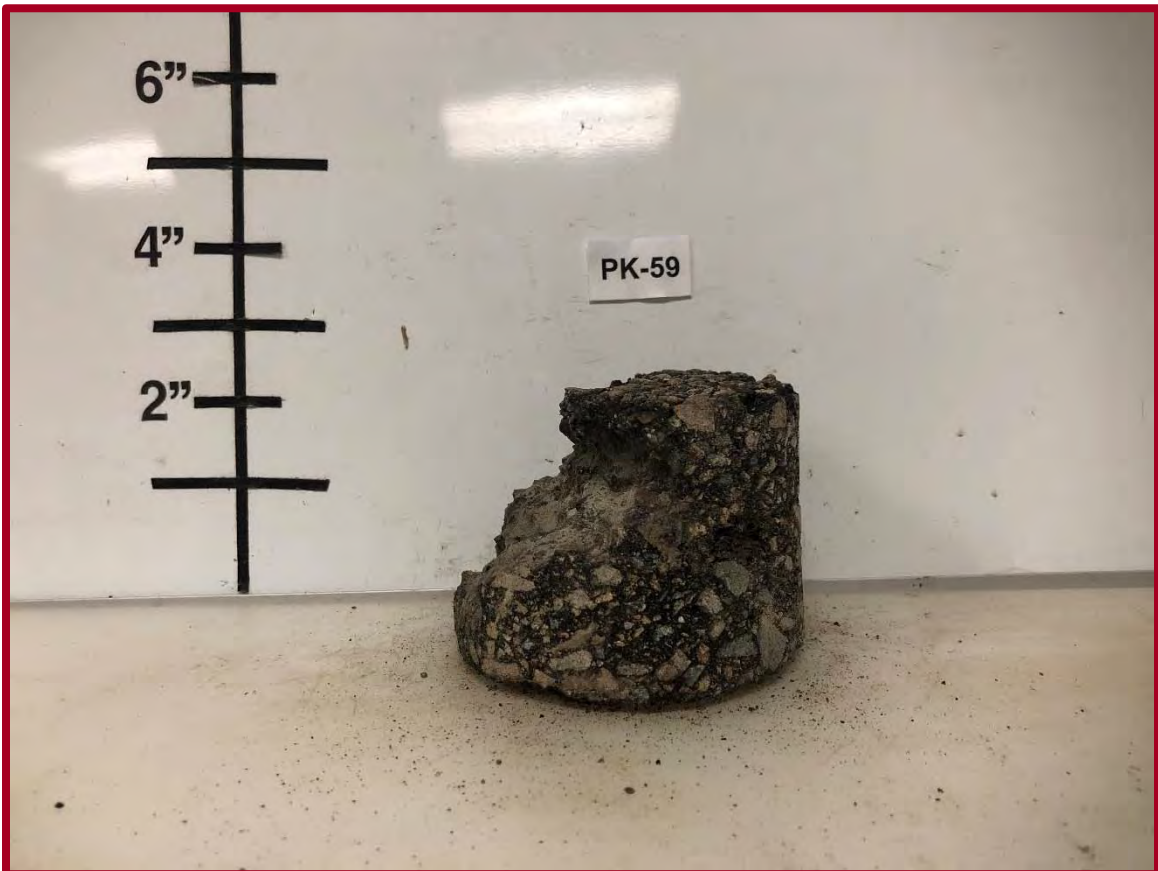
PHOTOGRAPH OF PAVEMENT CORE PK-59
